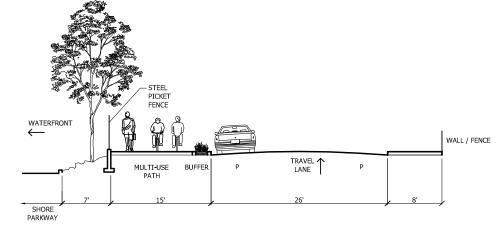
Possible Configuration for Wakeman Place between Sedgewick Place and Bergen Place
